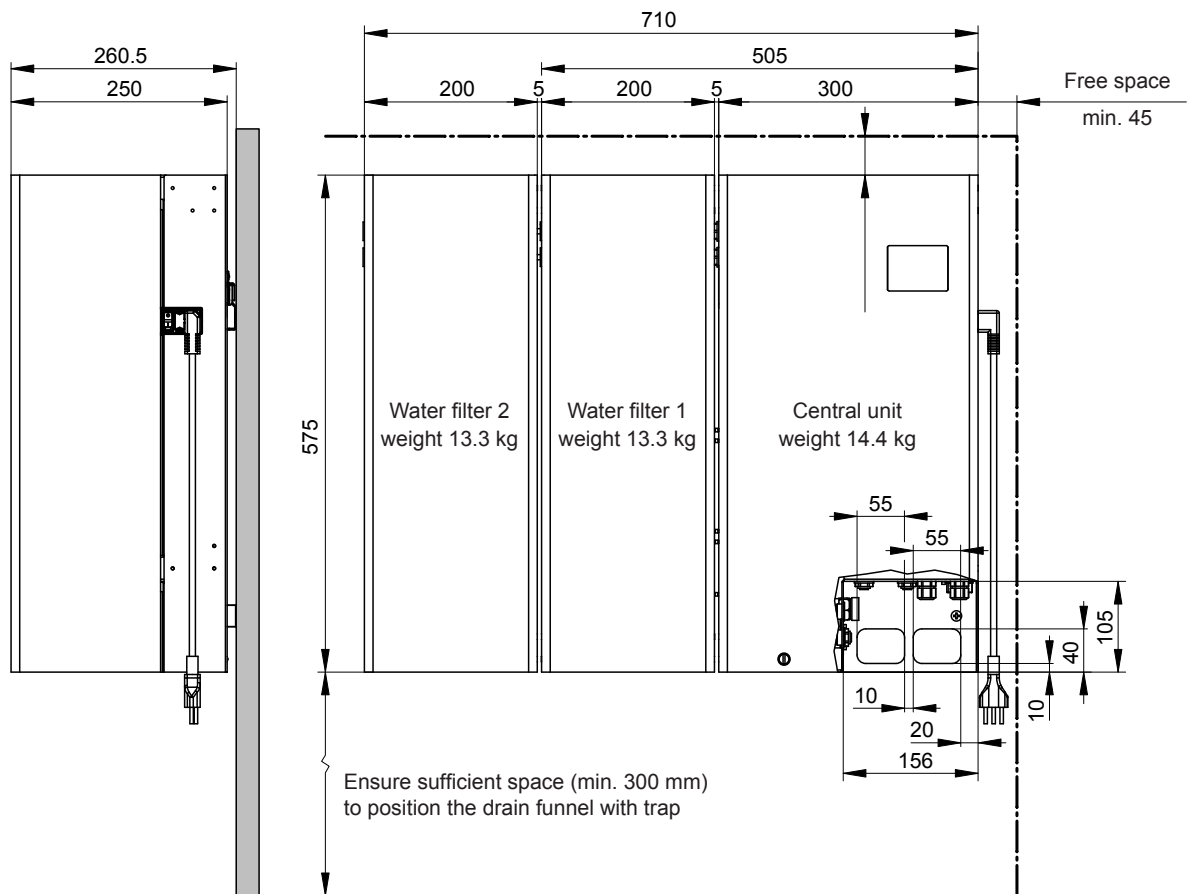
Central unit and water filter dimensions (dimensions in mm)
